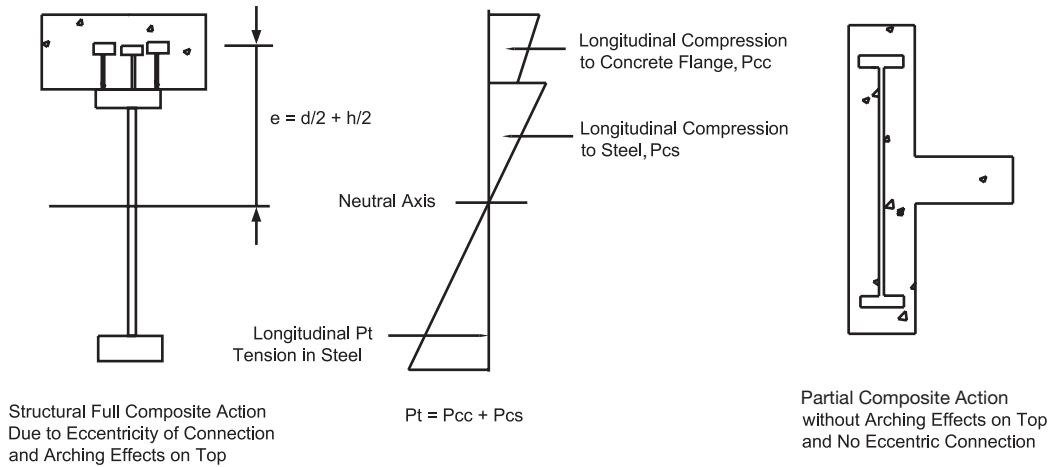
Full and partial composite action between slab and beam due to geometry of connection.
